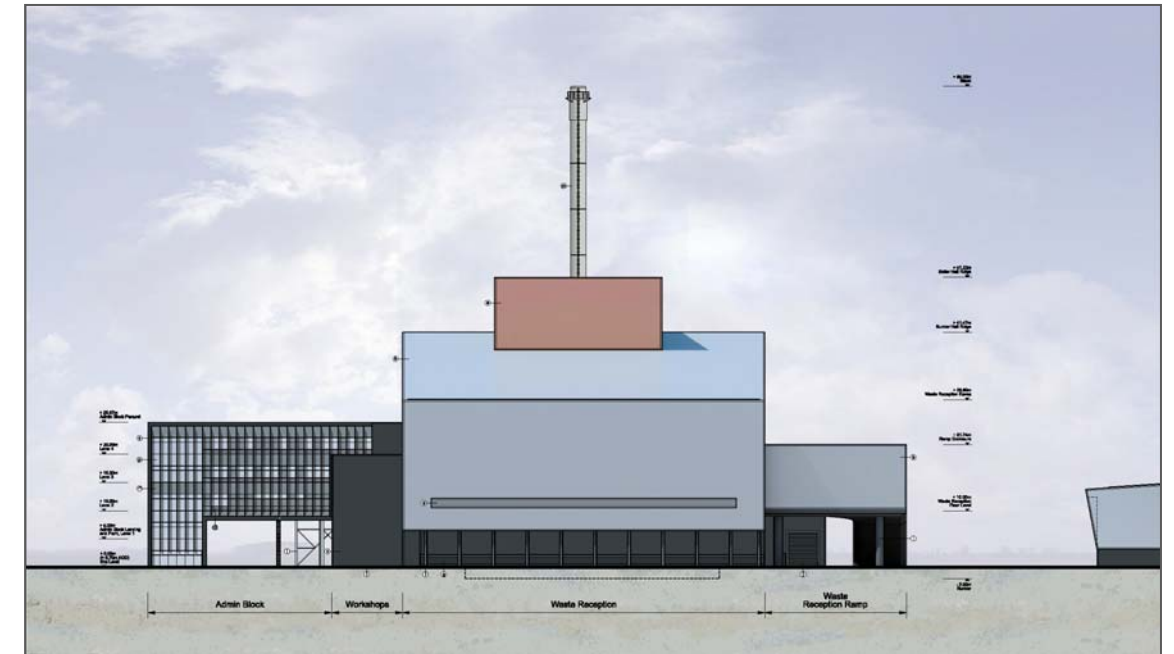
Proposed ERF north elevation – extract from drawings PL300
